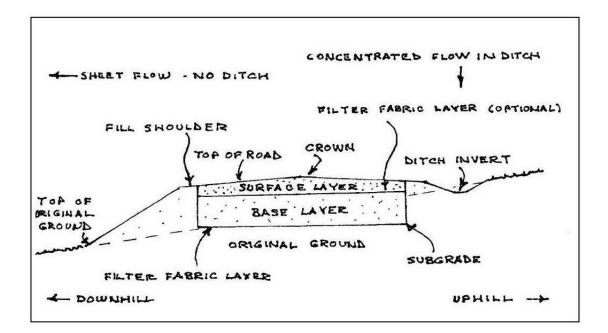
Typical Road Cross-Section – Canaan, NH Highway Department
